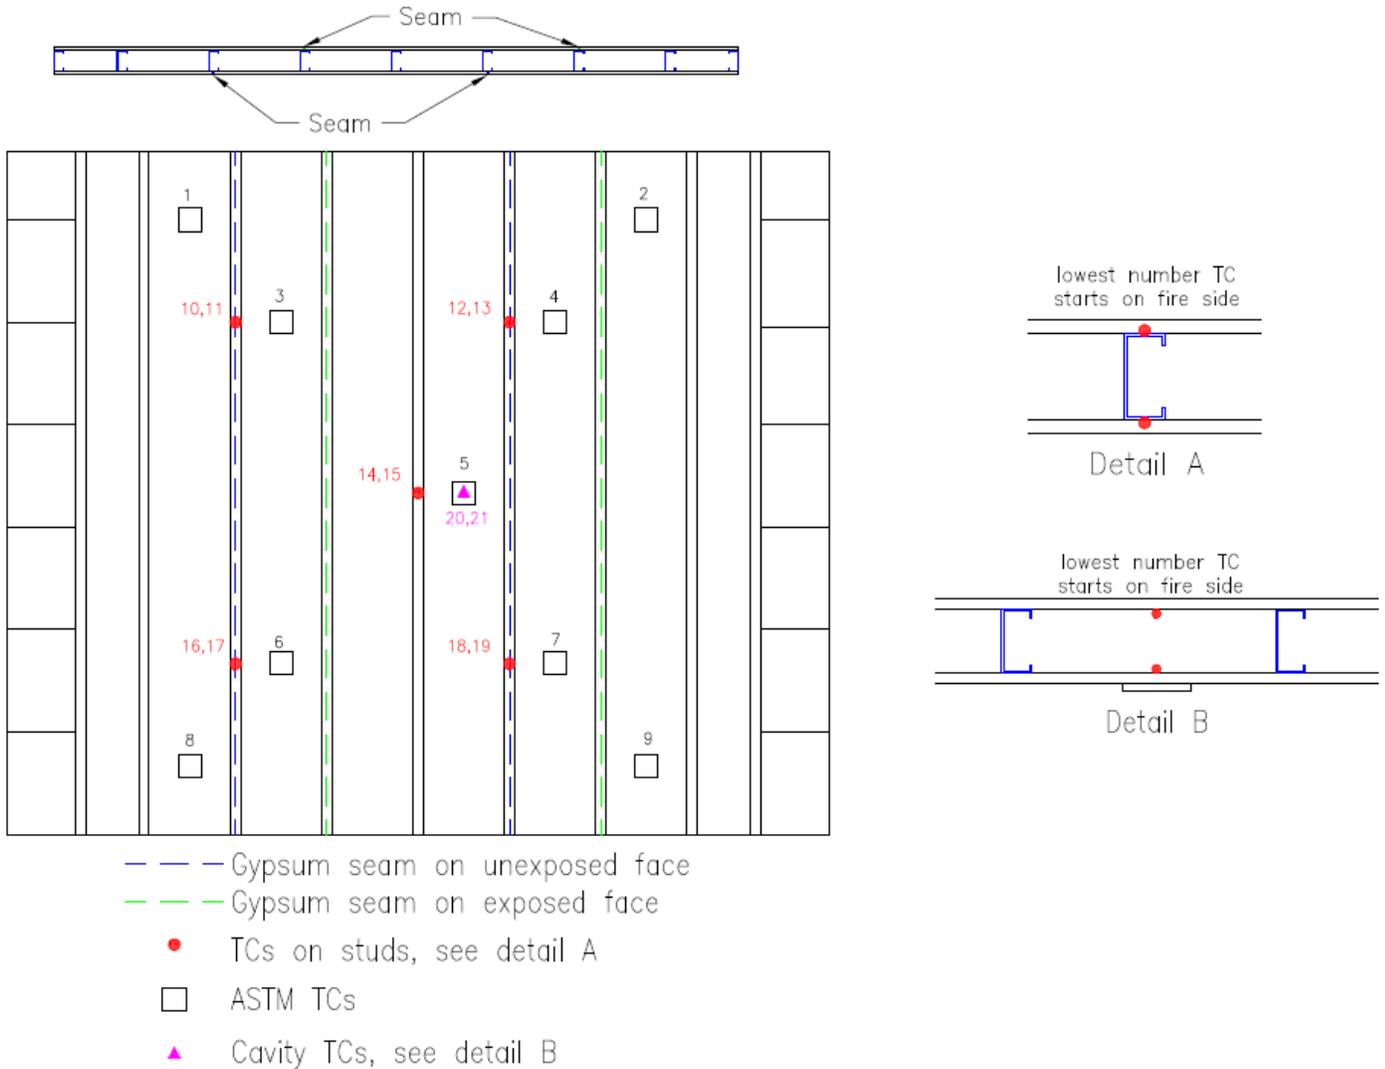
Gypsum/steel-stud wall assembly and location of thermocouples
